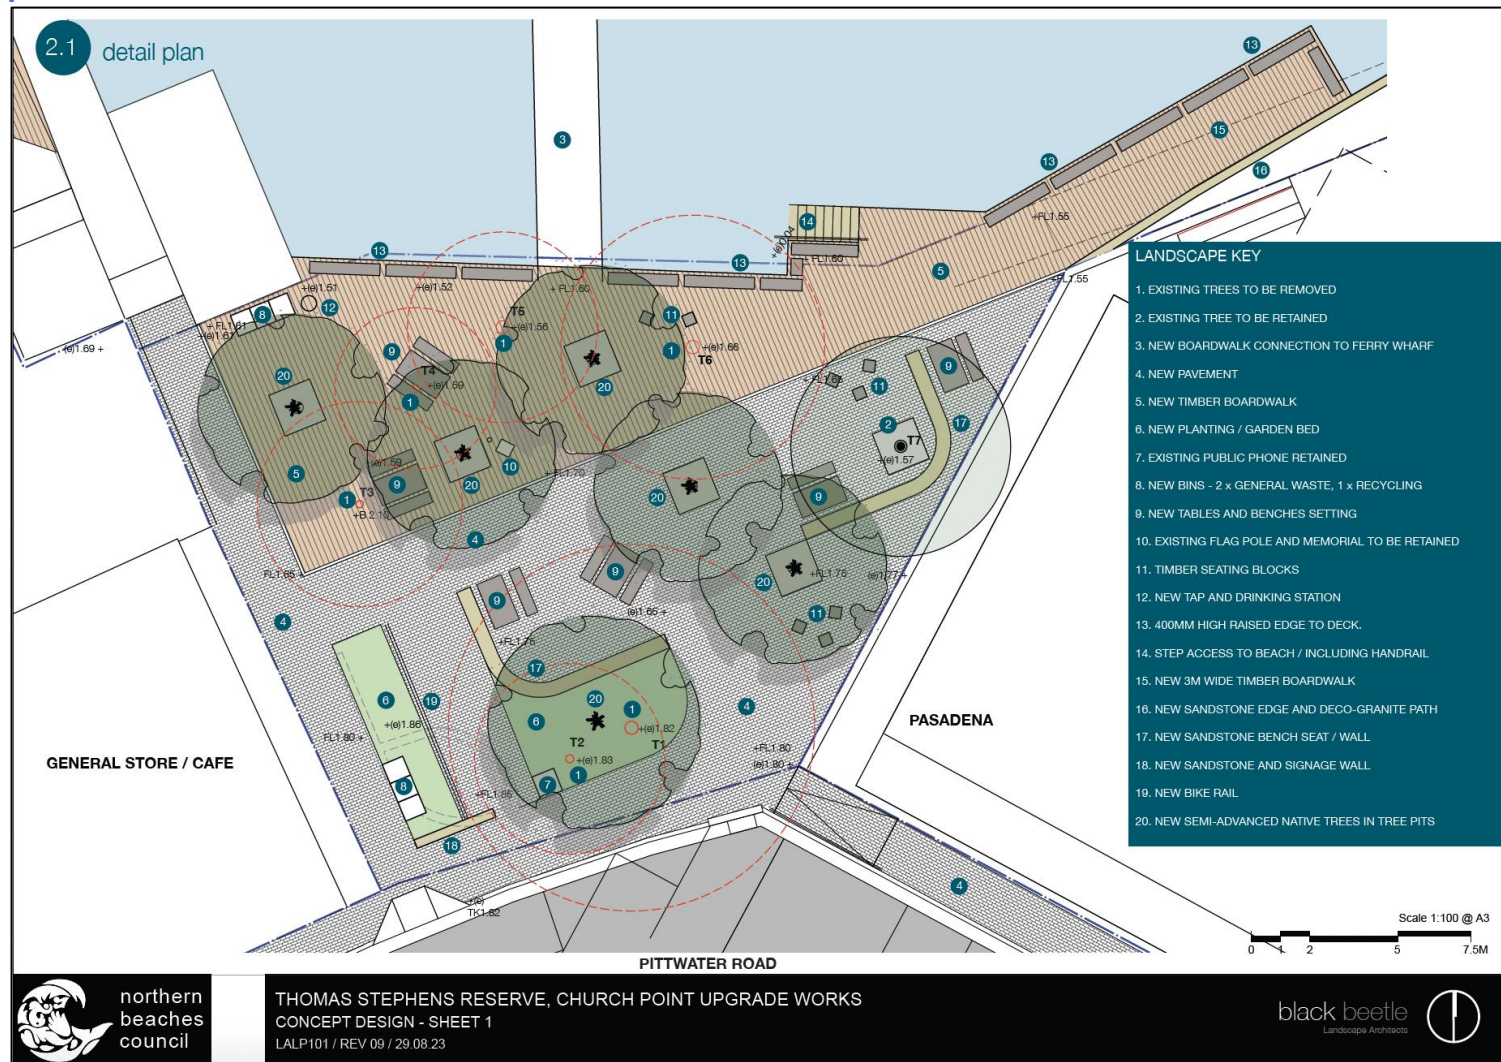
ILLUSTRATES PROPOSED SITE PLAN
